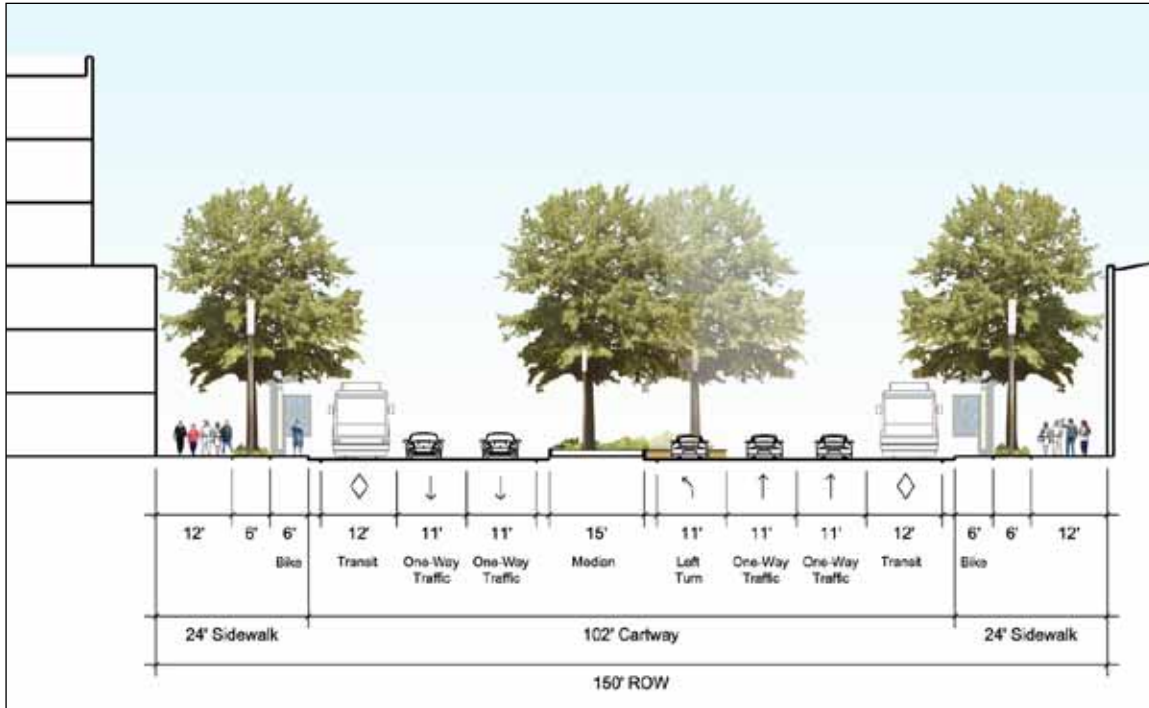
Van Dorn Street Transit Boulevard. This figure shows the proposed cross-section of Van Dorn Street north of Edsall Road with full development as a transit boulevard. The section is 10 feet wider south of Edsall to provide a second northbound left-turn lane at Edsall Road.
